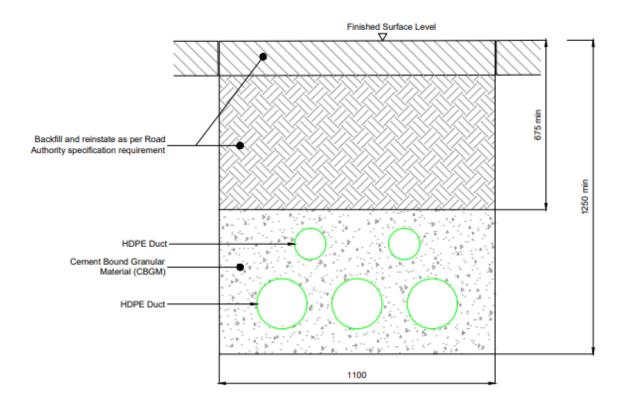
Typical cross section of a single 220 kV circuit trench in flat formation: extracted from planning drawing no. 229100714-MMD-00-XX-DR-C-0051
